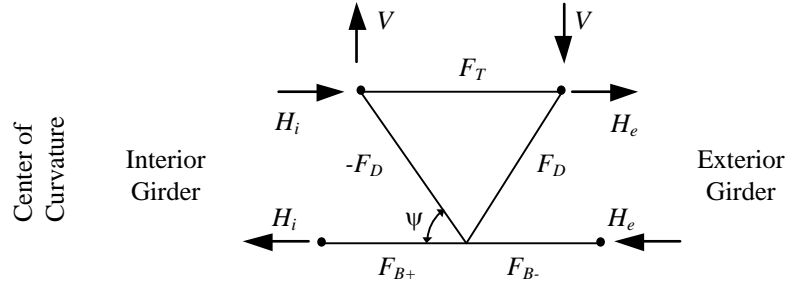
Set of forces required to connect the girders on the radial abutment of NTCCS22.
